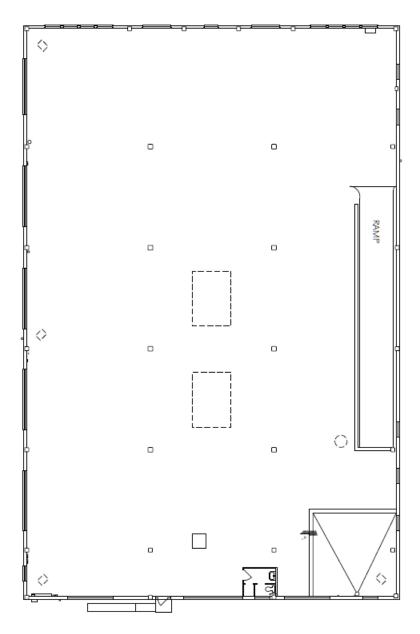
Existing 2nd Floor Plan. Courtesy of Open Studio Architecture. N
